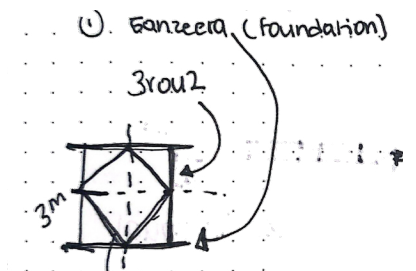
Sketch of bracing structure of 10x10 Pigeon Tower
